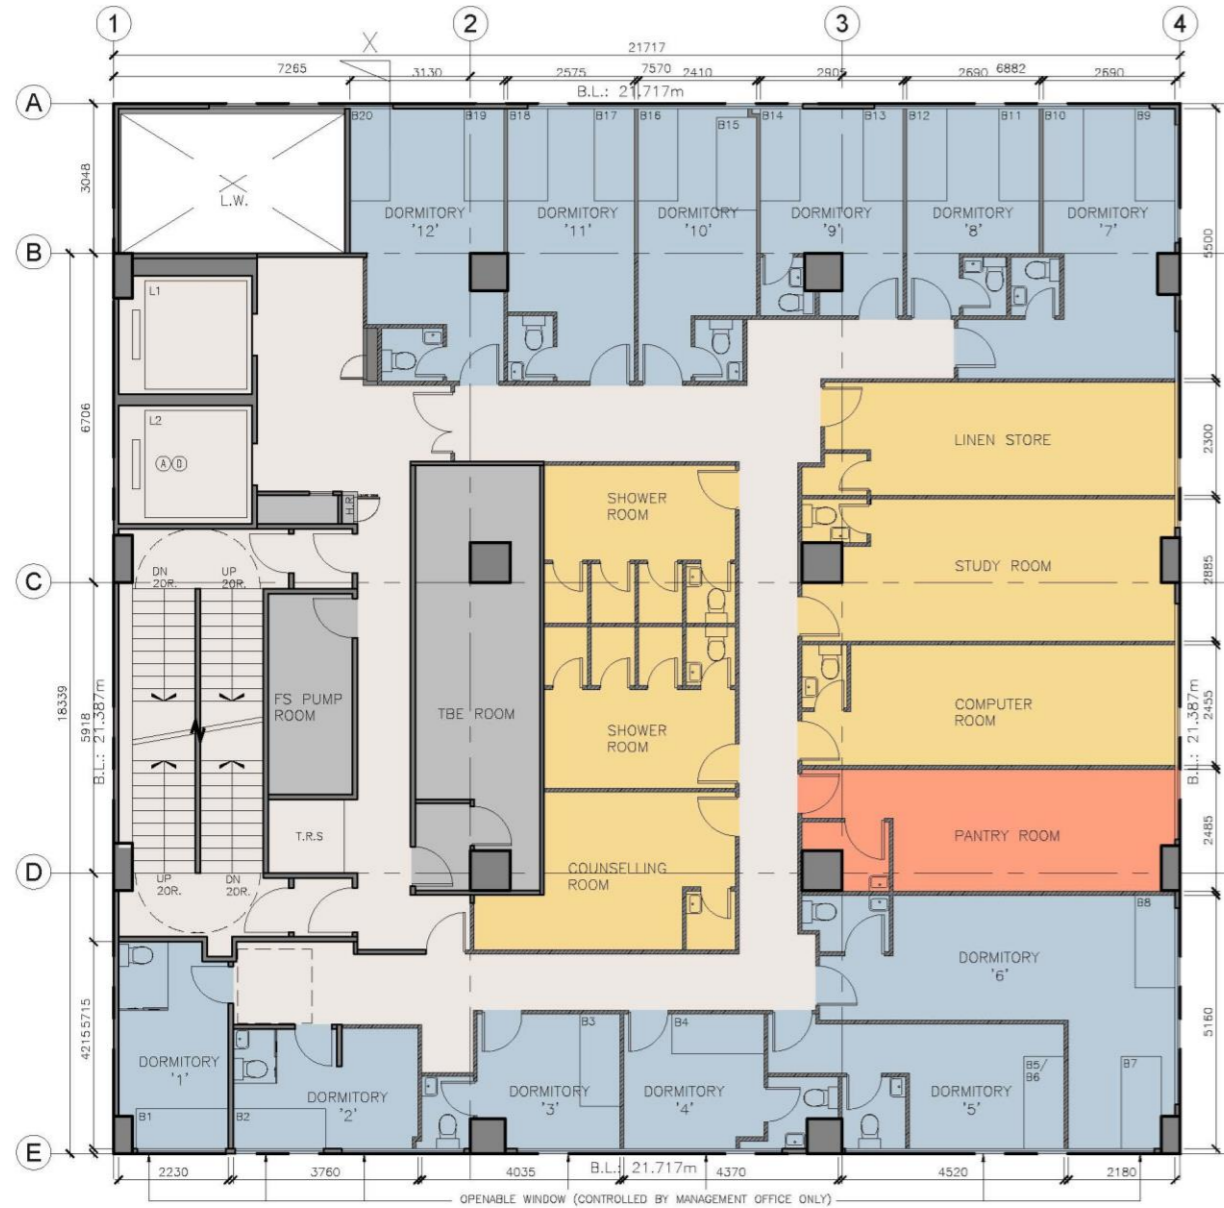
Layout of the Project Building Plan - Ground Floor & First Floor
